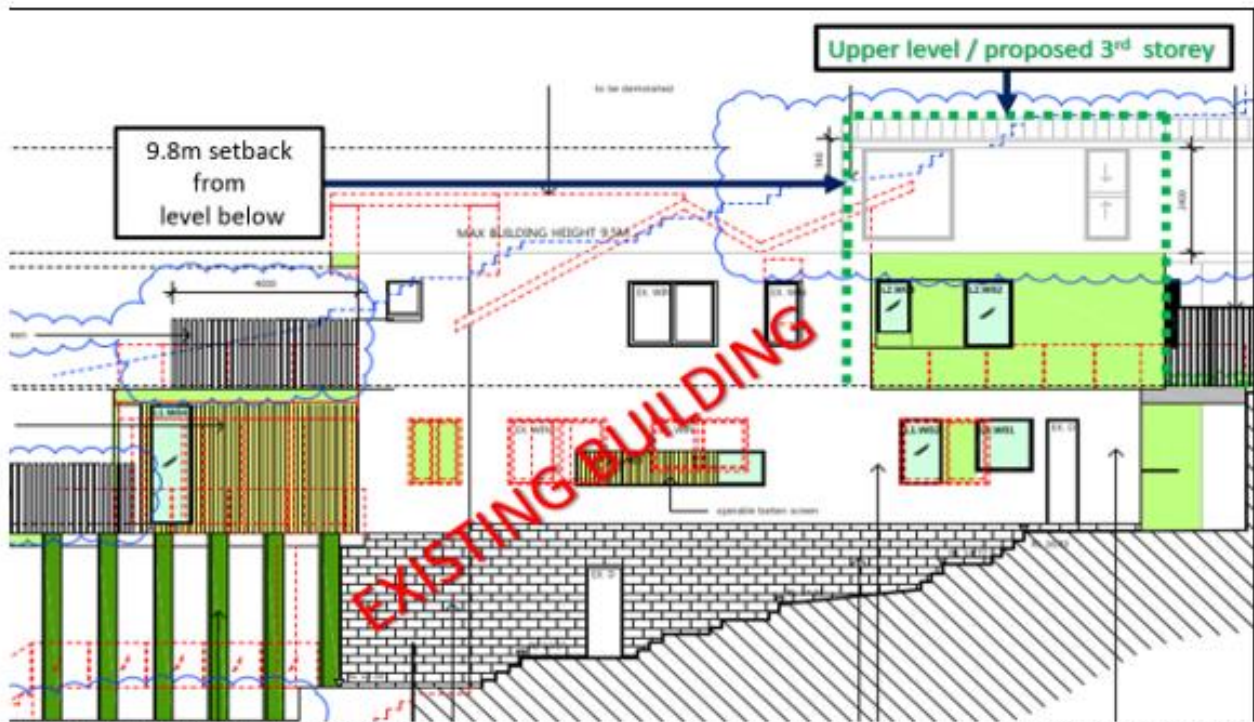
South-eastern elevation Proposed element of upper level which is 3 storeys (green dashed line).
